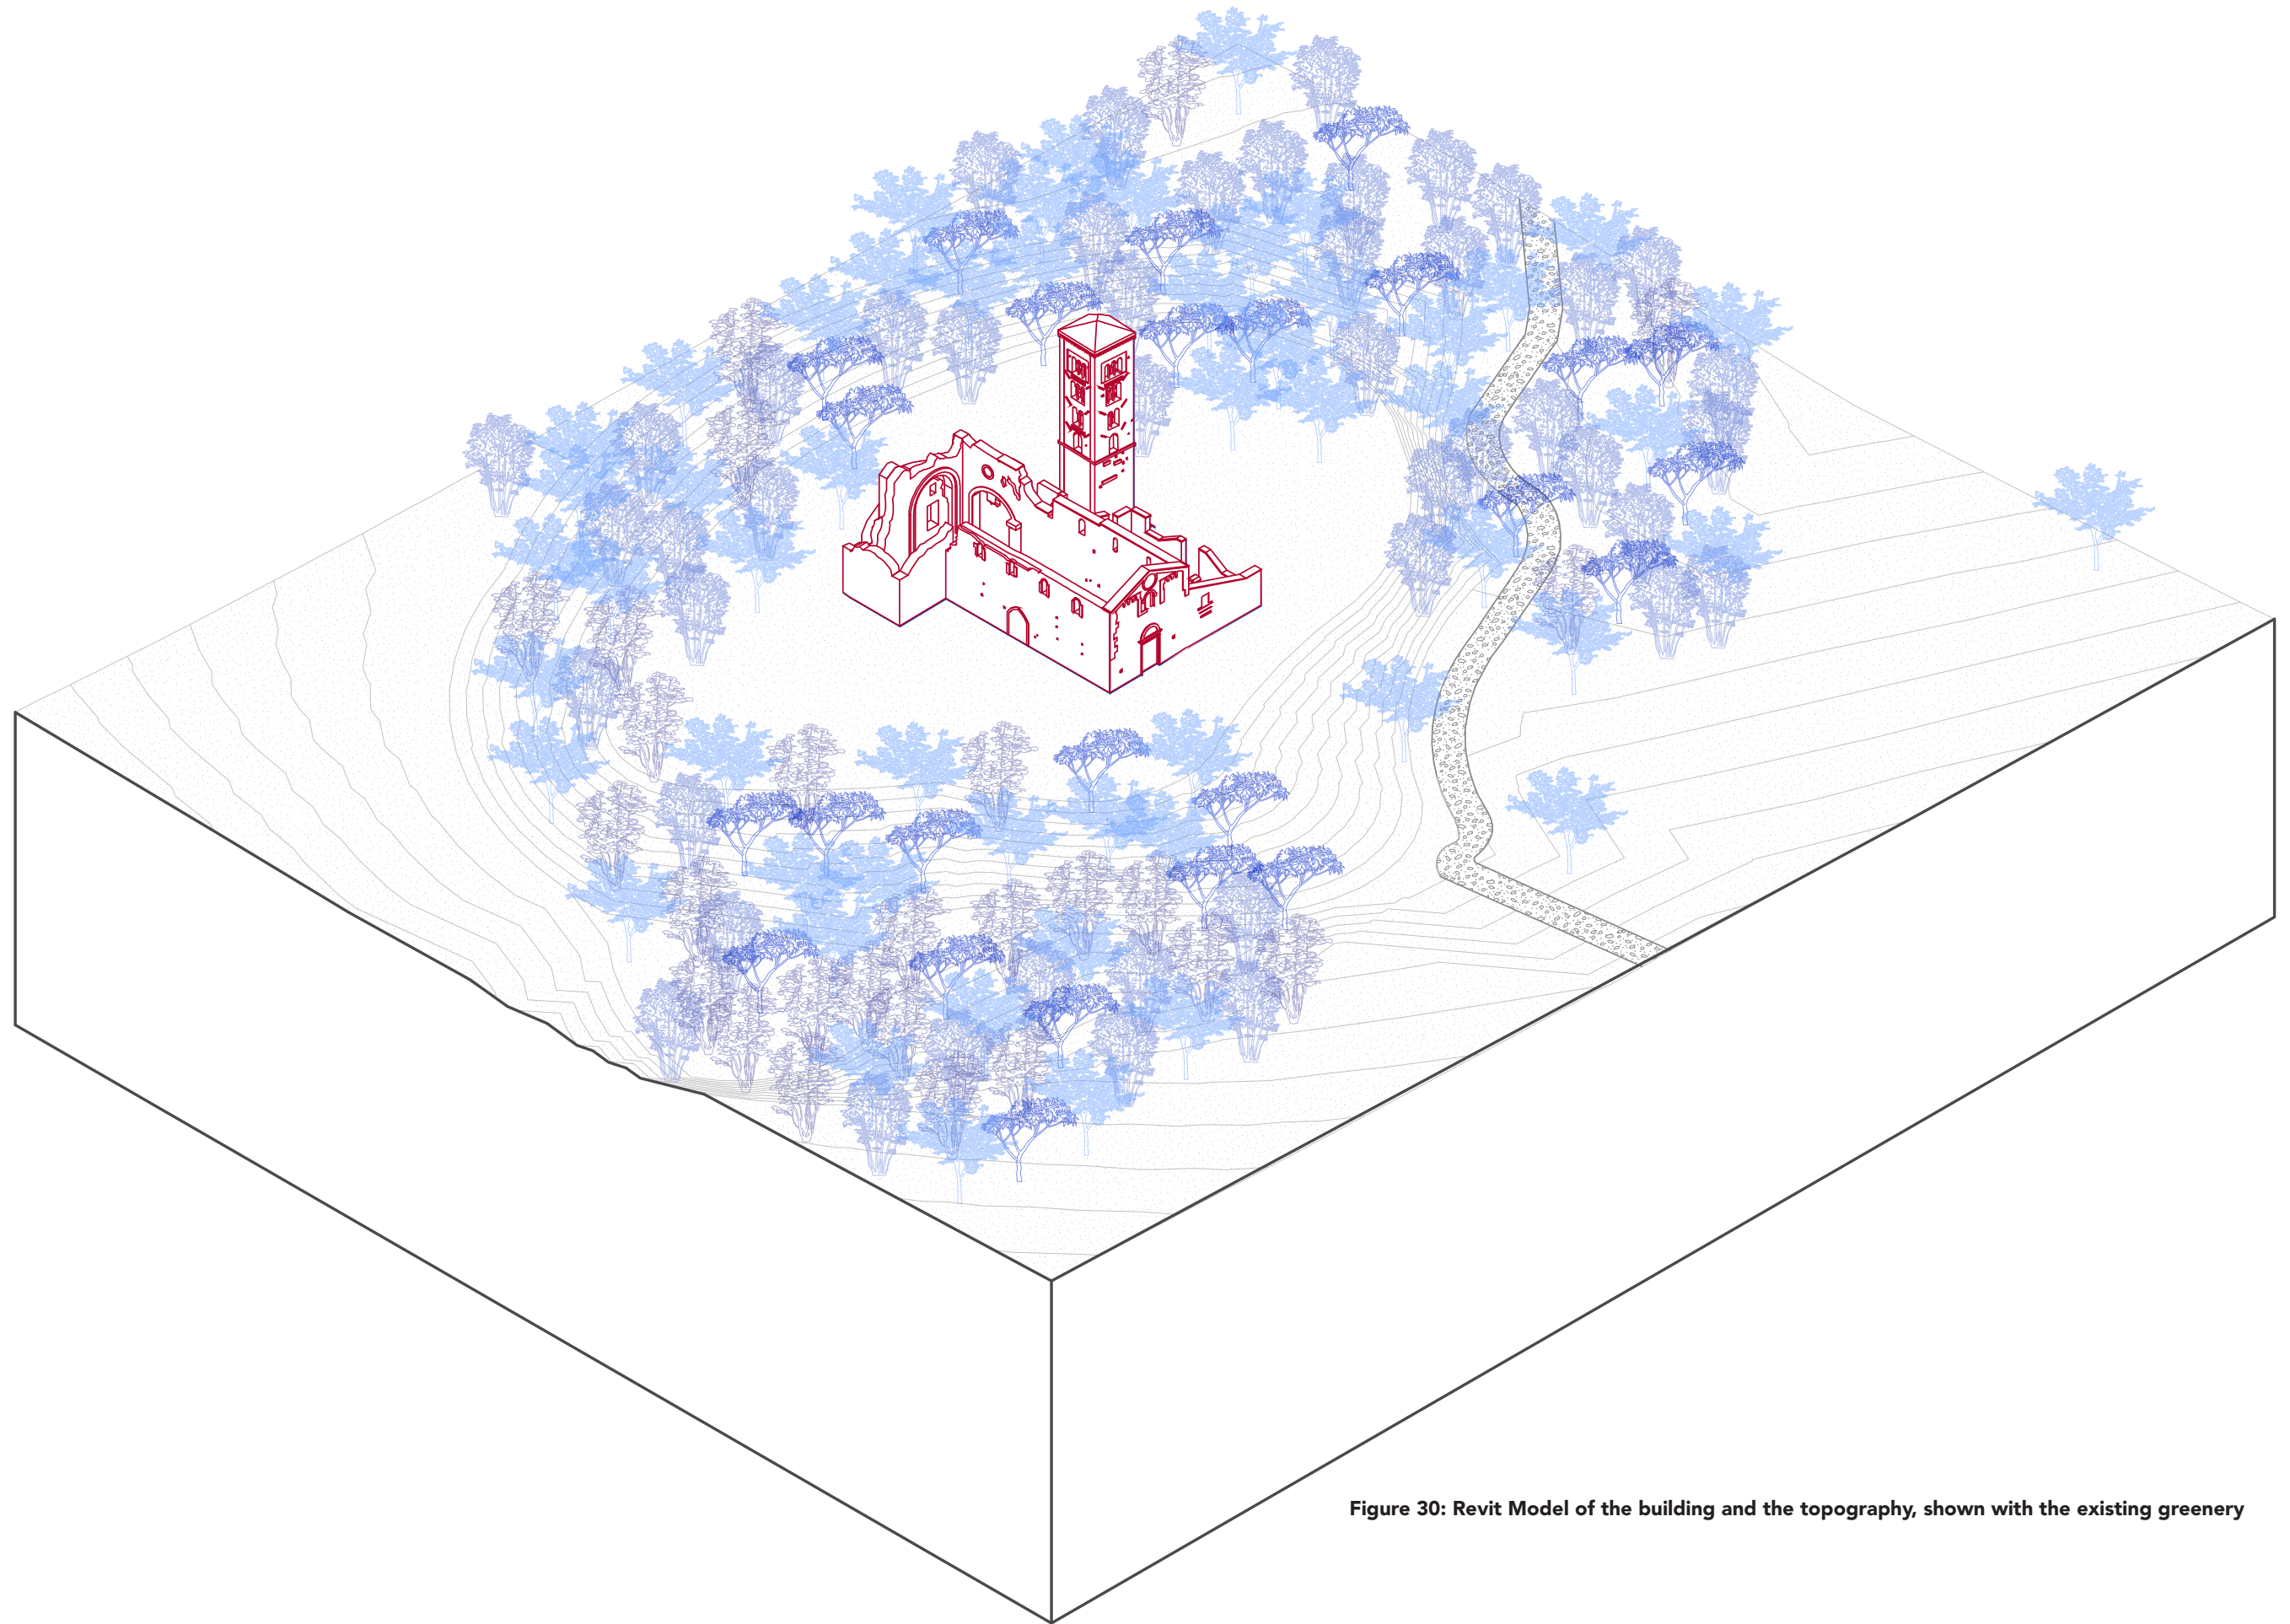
Revit Model of the building and the topography, shown with the existing greenery
